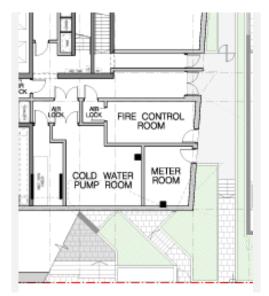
Stage 1 Mod 2 Approved Lower Ground Floor Plan extract
